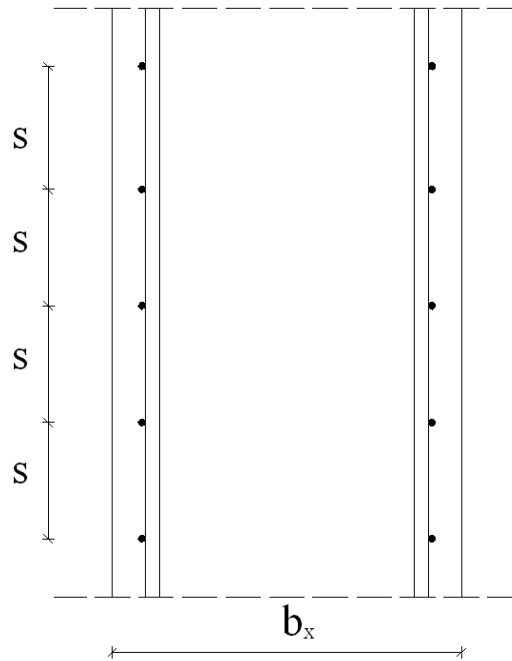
Longitudinal section view of reinforced concrete column.
